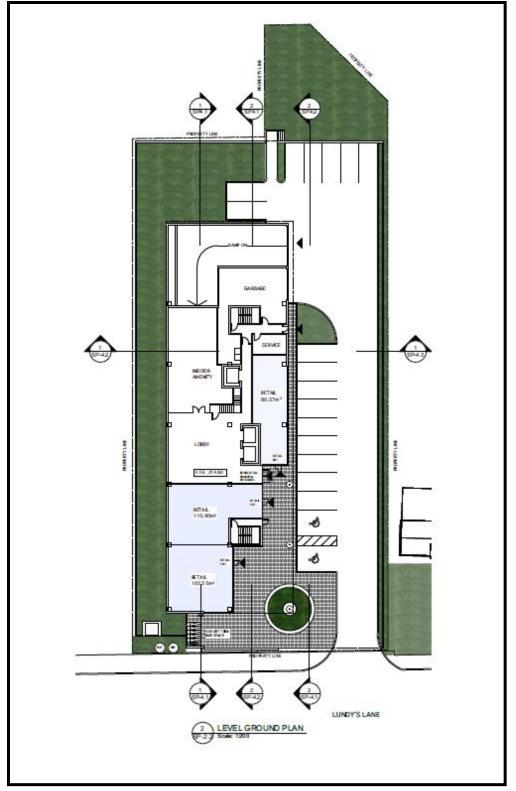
2023 Proposed Development at 6179 Lundy's Lane Ground Level (MB1 Urban Planning 2023b)
